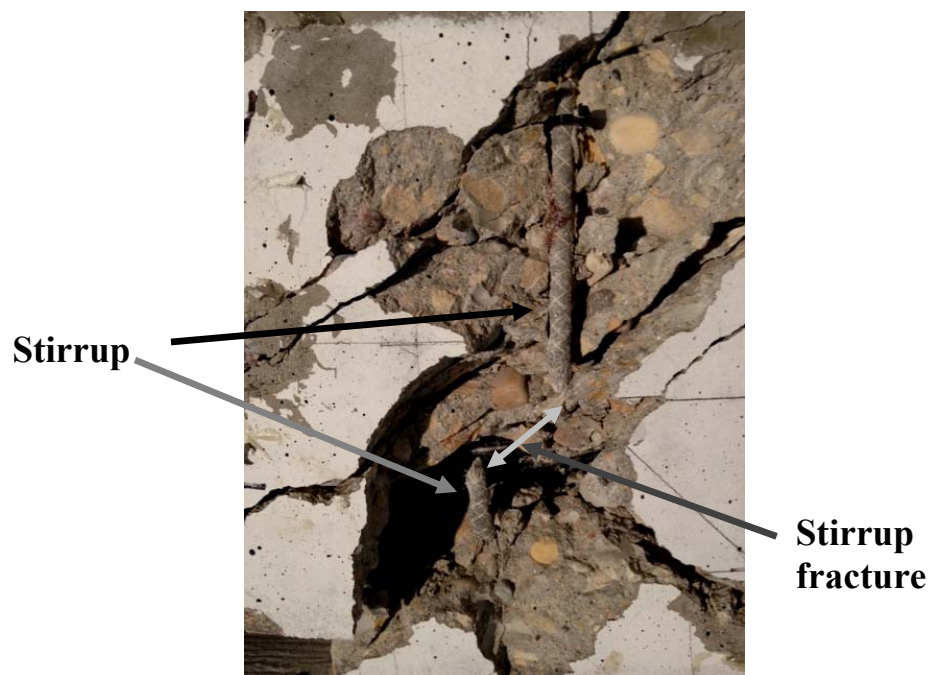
2: Failed stirrup near the support for beams S2-2.5
